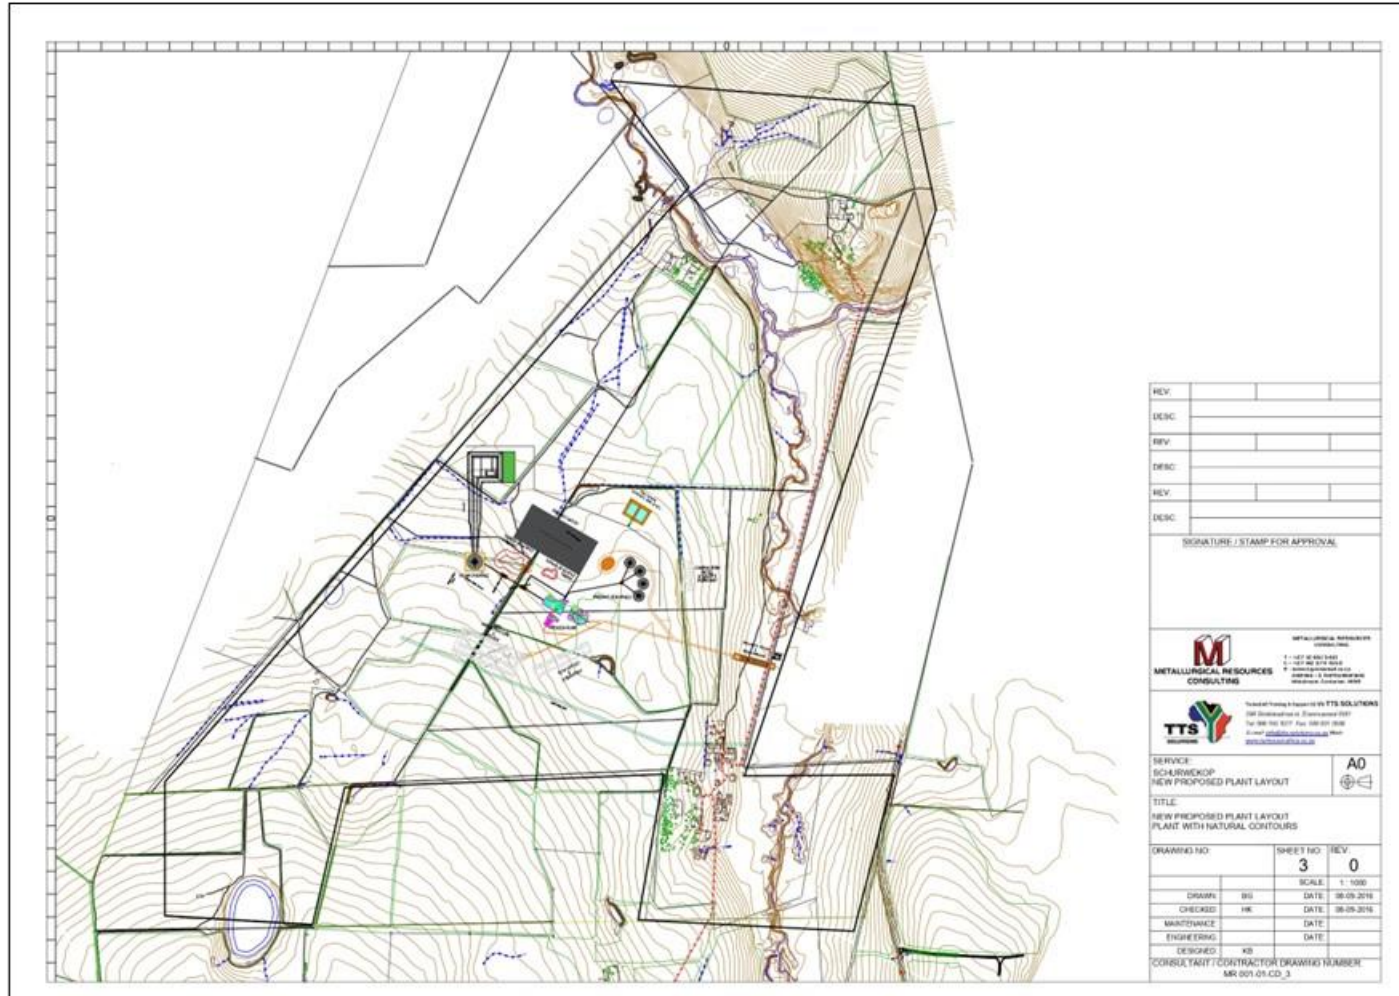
Layout Alternative 1 (Metallurgical Resources Consulting, 2016)
